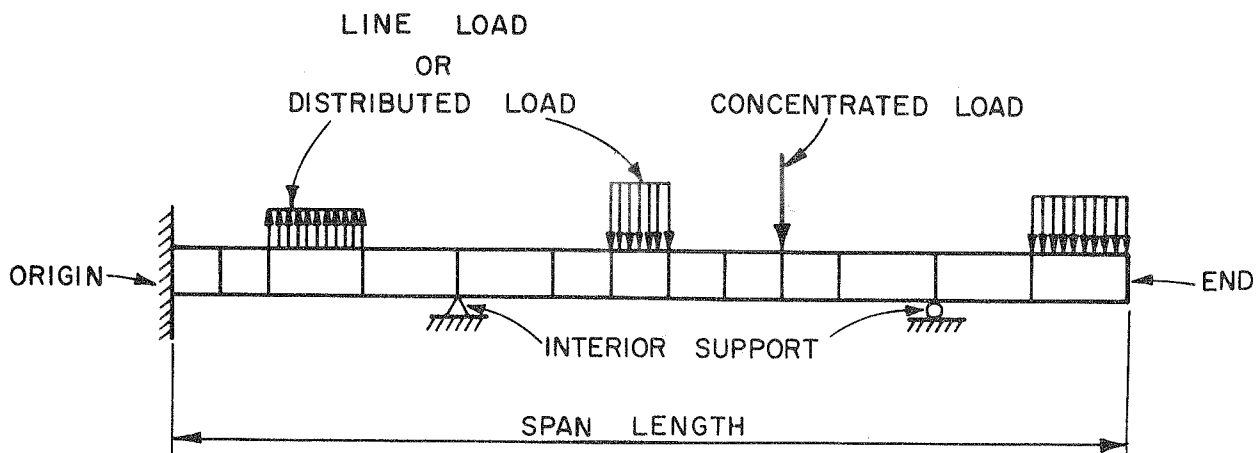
LONGITUDINAL ELEVATION AND LOADING
